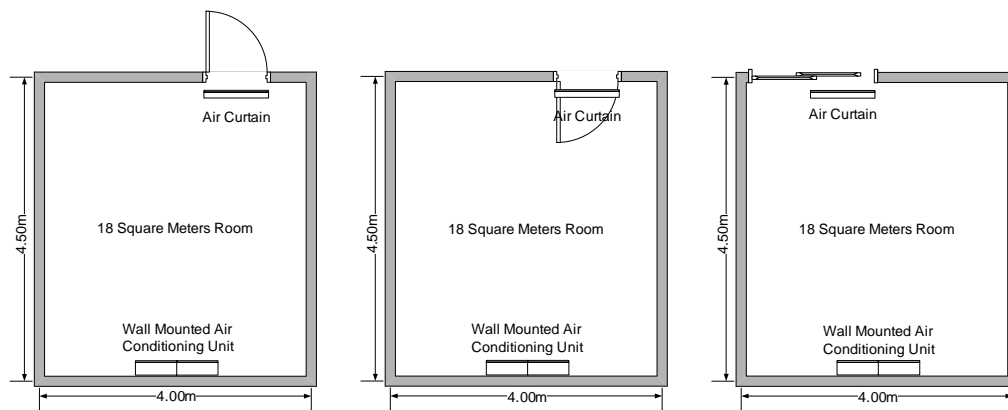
Floor Plan of Experiments 1 – 3: A Single Door with Air Curtain
